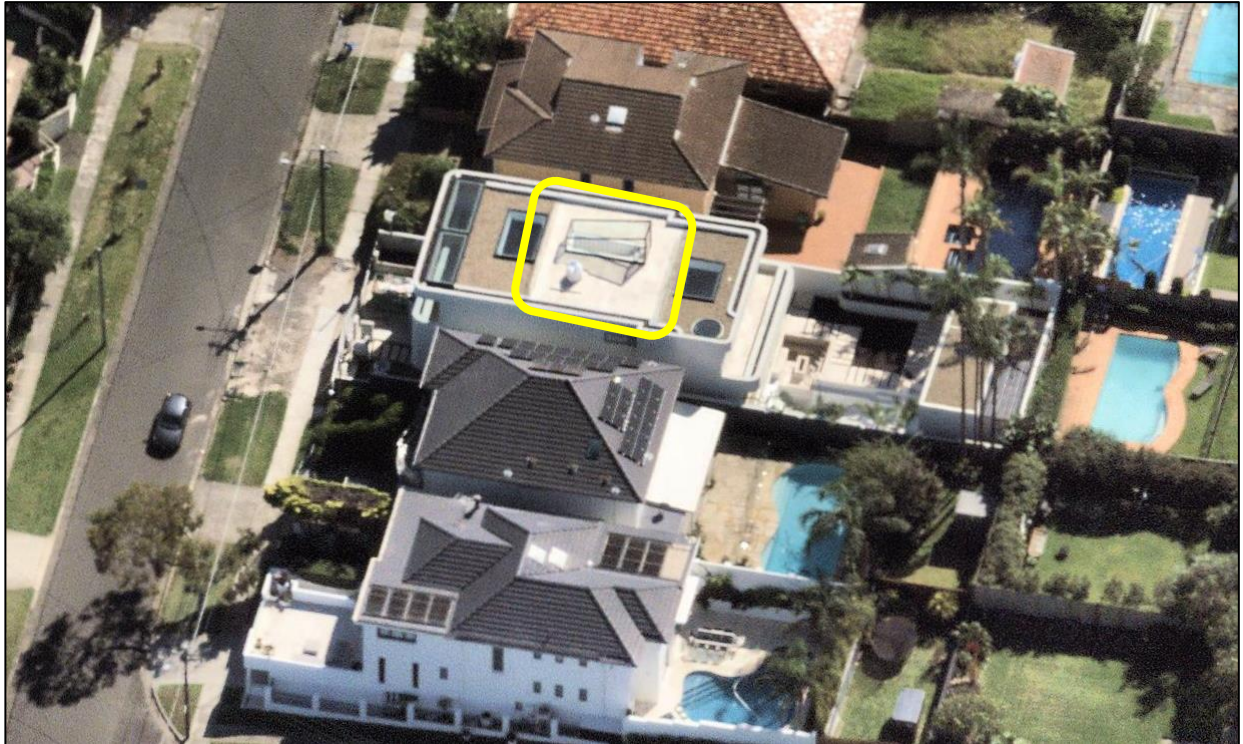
Satellite imagery taken on 7 April 2024 showing the unauthorised enlarged roof terrace and roof access hood (Source: Nearmap, 2024).
